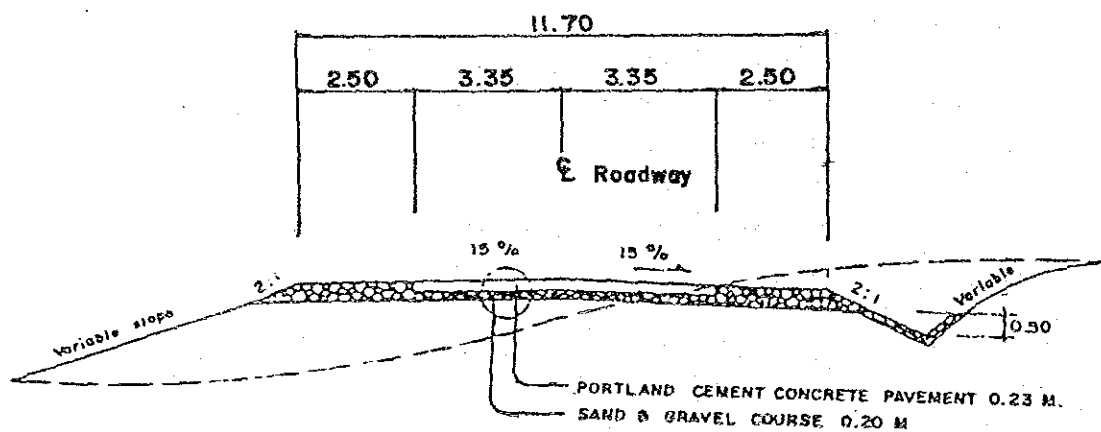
TYPICAL CROSS SECTION OF PAN-PHILIPPINE HIGHWAY
